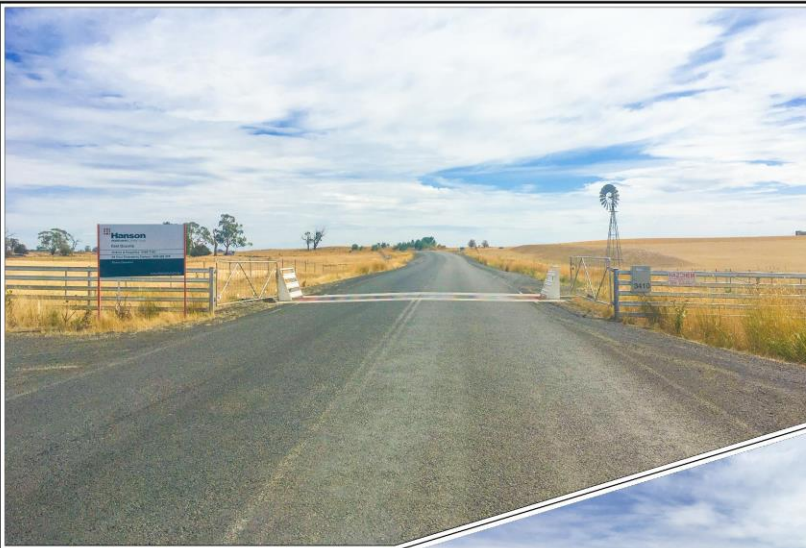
View of the Site Access Road looking north from the access gate (Ref: Plate 1)
